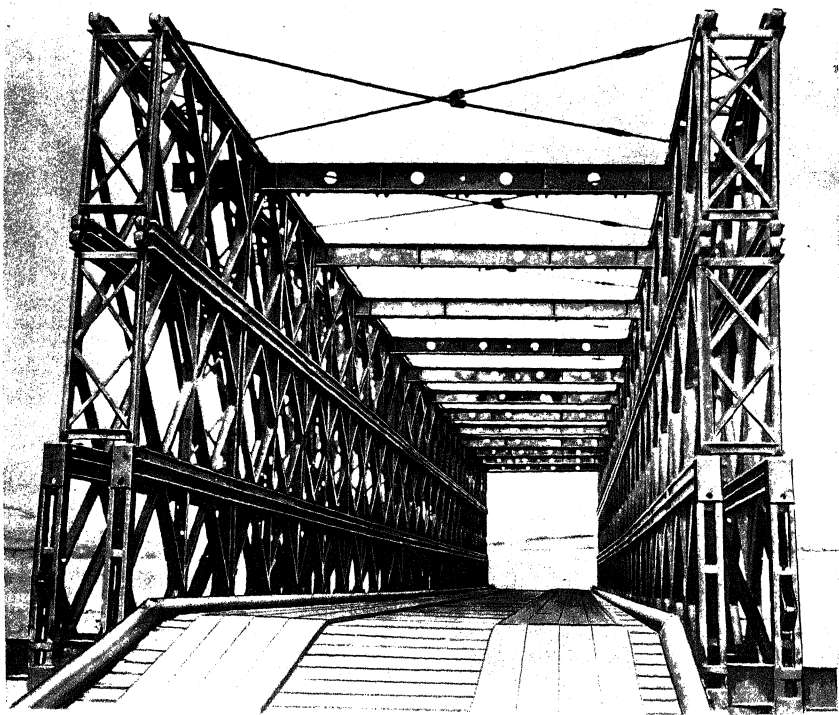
Overhead bracing on triple-story bridge with bracing in inverted third-story panels.
